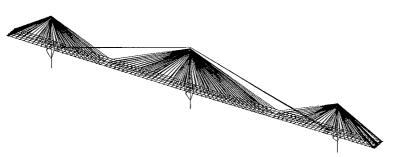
Simplified finite element model of Ting Kau Bridge using twin triple-girder modelling
